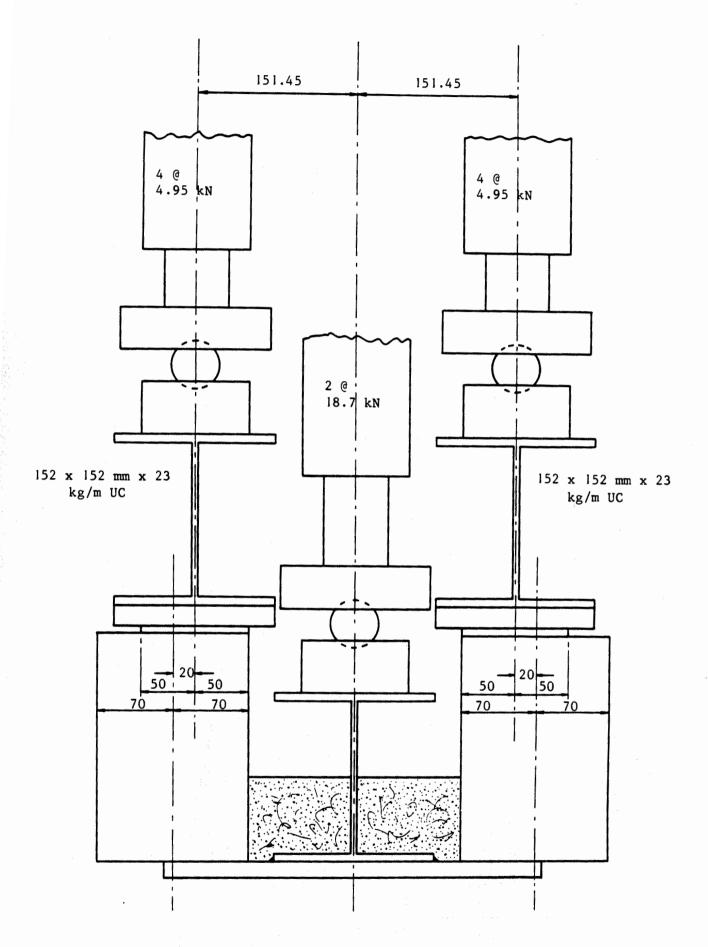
APPLIED LOAD POSITIONS - TRANSVERSE ARRANGEMENT - TEST NO. WFRC 54278
